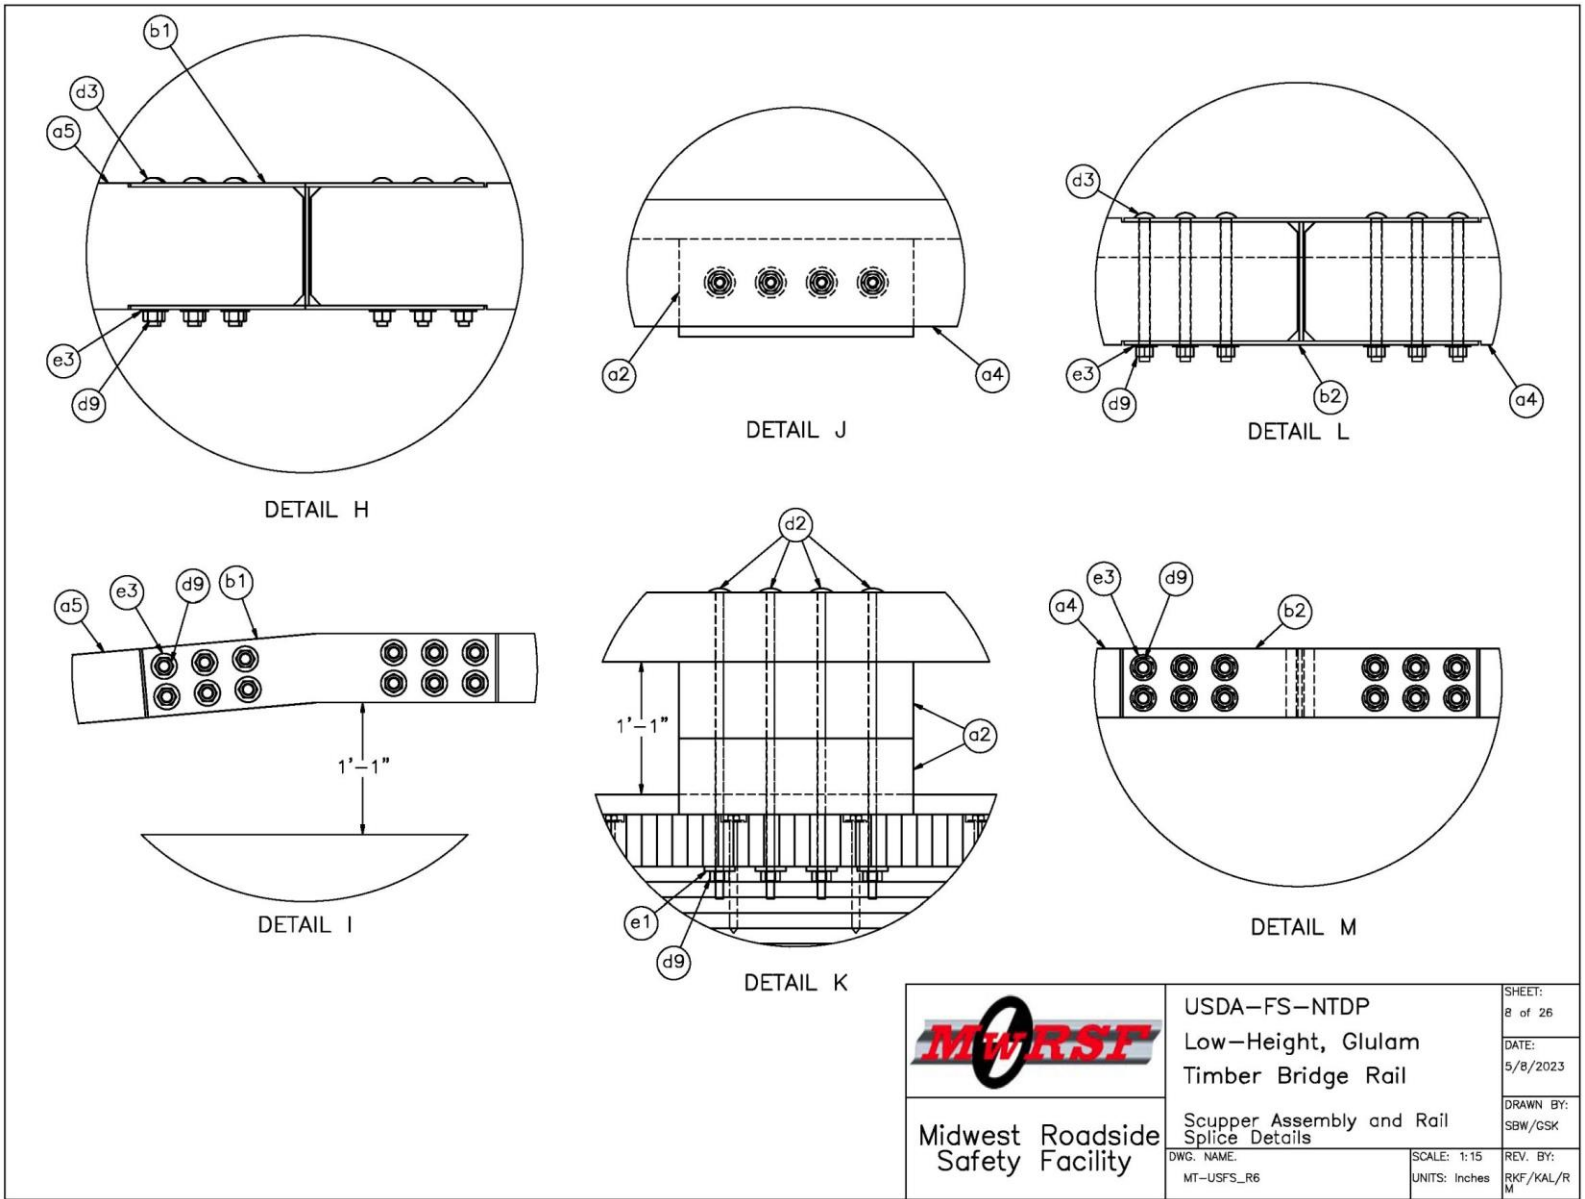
USDA-FS-NTDP Low-Height, Glulam Timber Bridge Rail: Scupper Assembly and Rail Splice Details
